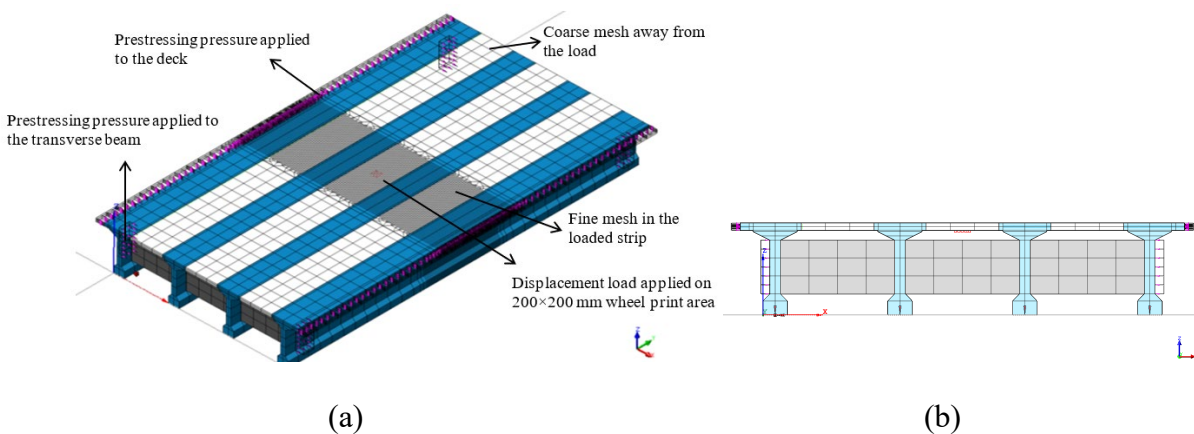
The finite element solid bridge model: (a) 3D view; (b) Transverse cross-section.
